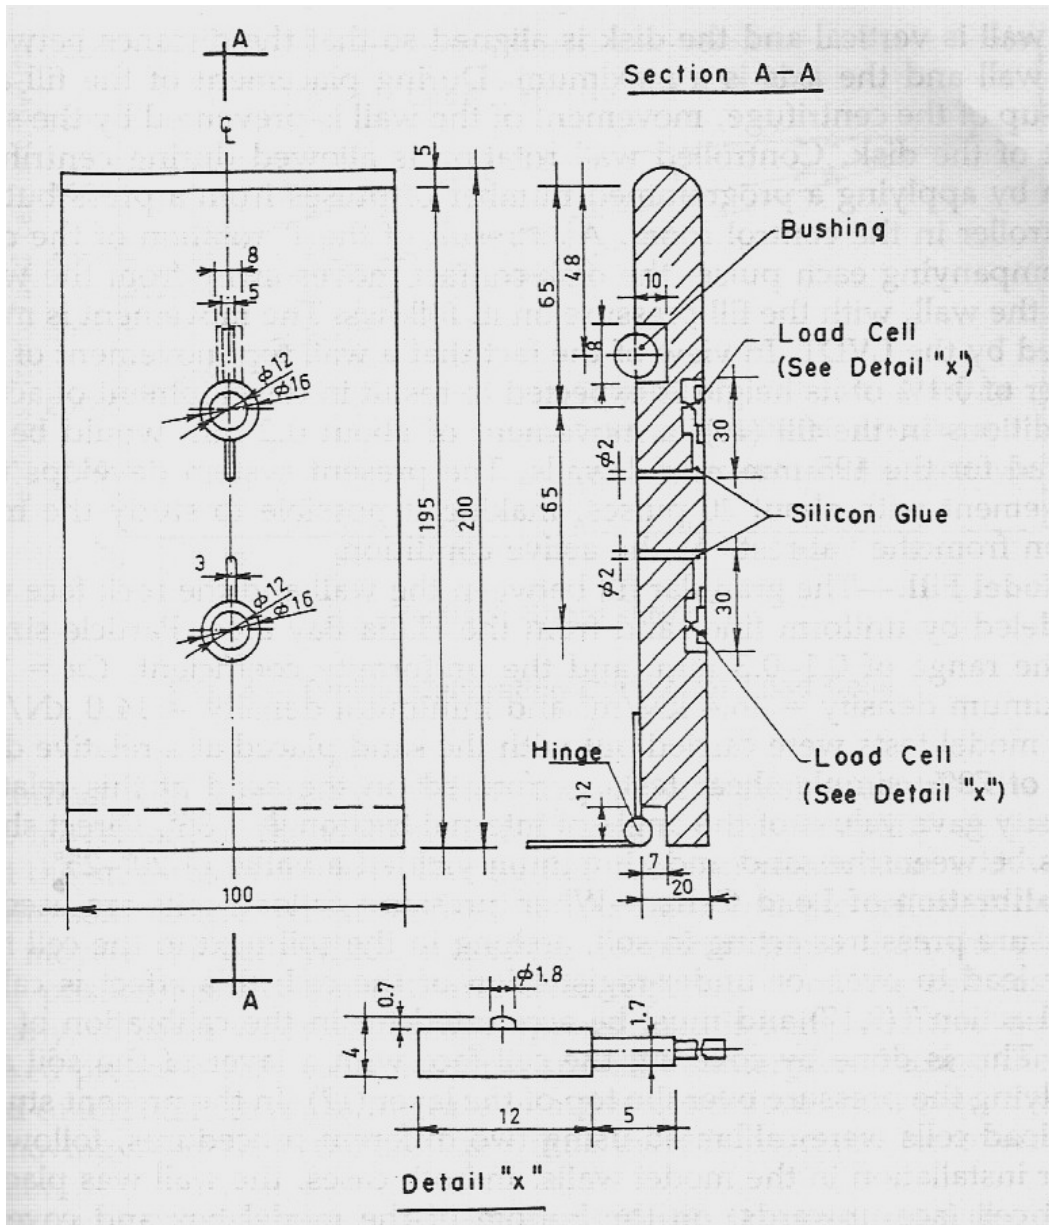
Model retaining wall (after Frydman and Keissar, 1987)
